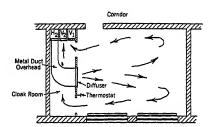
Plan of a Classroom in a School Ventilated by a Central Fan
